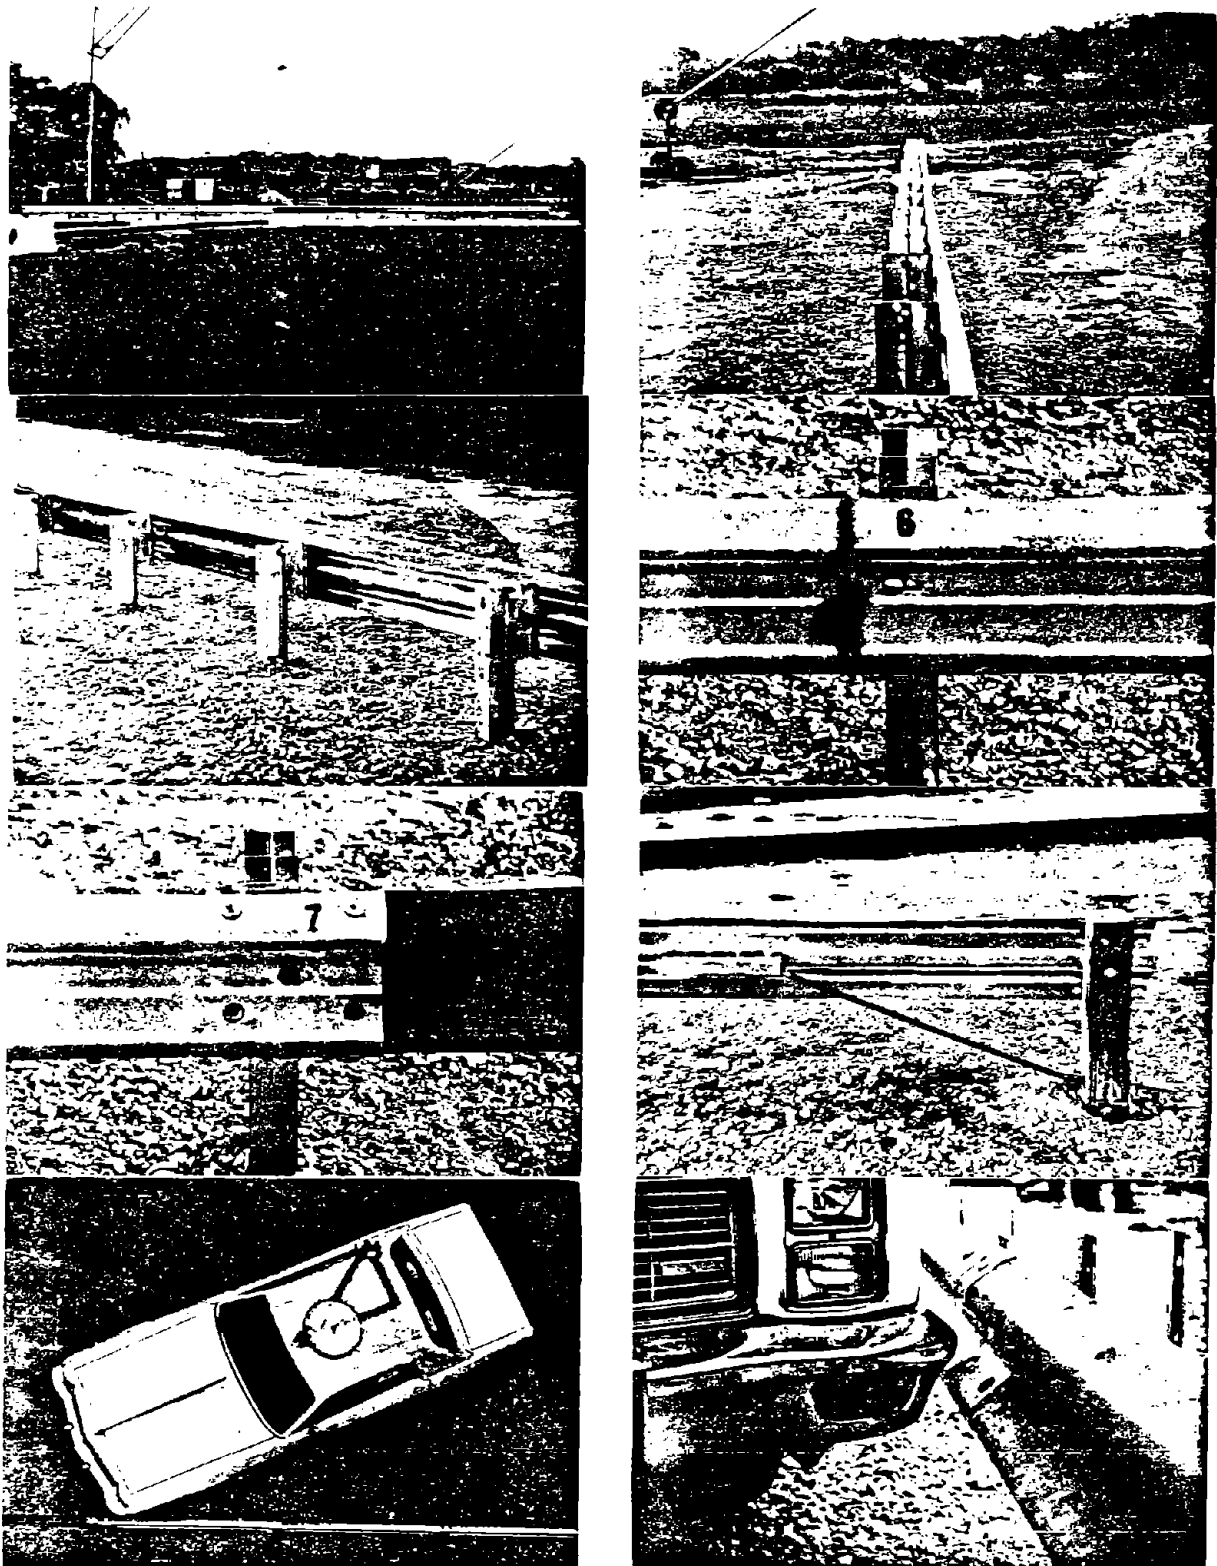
Pre-impact barrier and vehicle details, test SPI-3.
